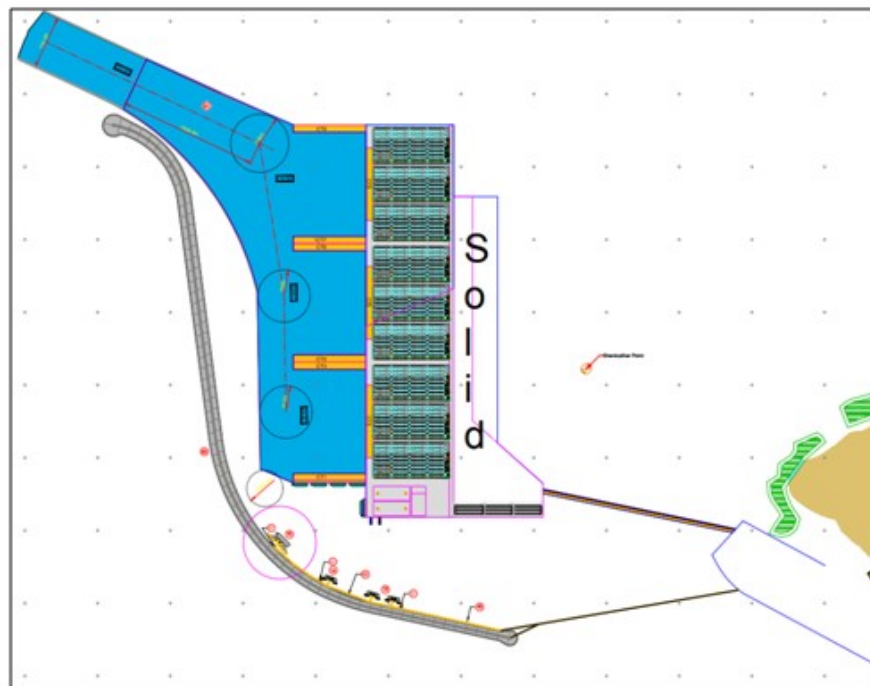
B: Proposed Modified Master Plan Layout at Vadhvan without North Breakwater
